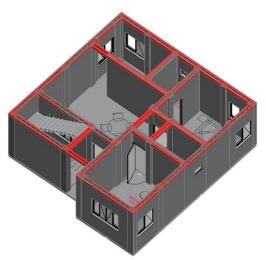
Typical RC frame integration for 3D printing of structure at 1<sup>st</sup> Floor IvI. of one building
